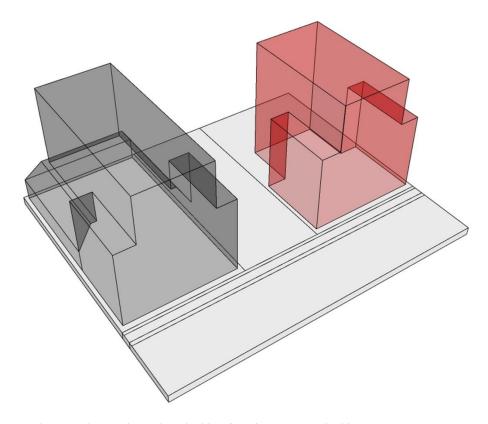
Recession plane envelope and complying building form for a 10 storey building.
